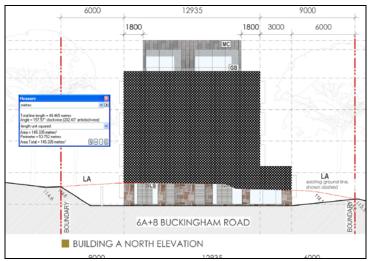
The building plane has an area of 145m2 measured above the natural ground level at the front boundary
